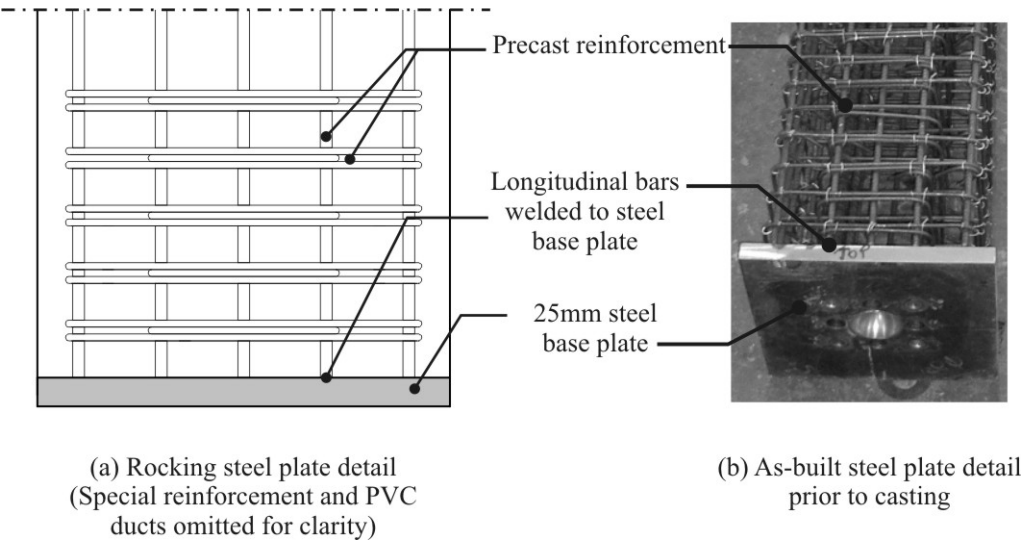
Structural details for post-tensioned piers HBD4 and HBD5
